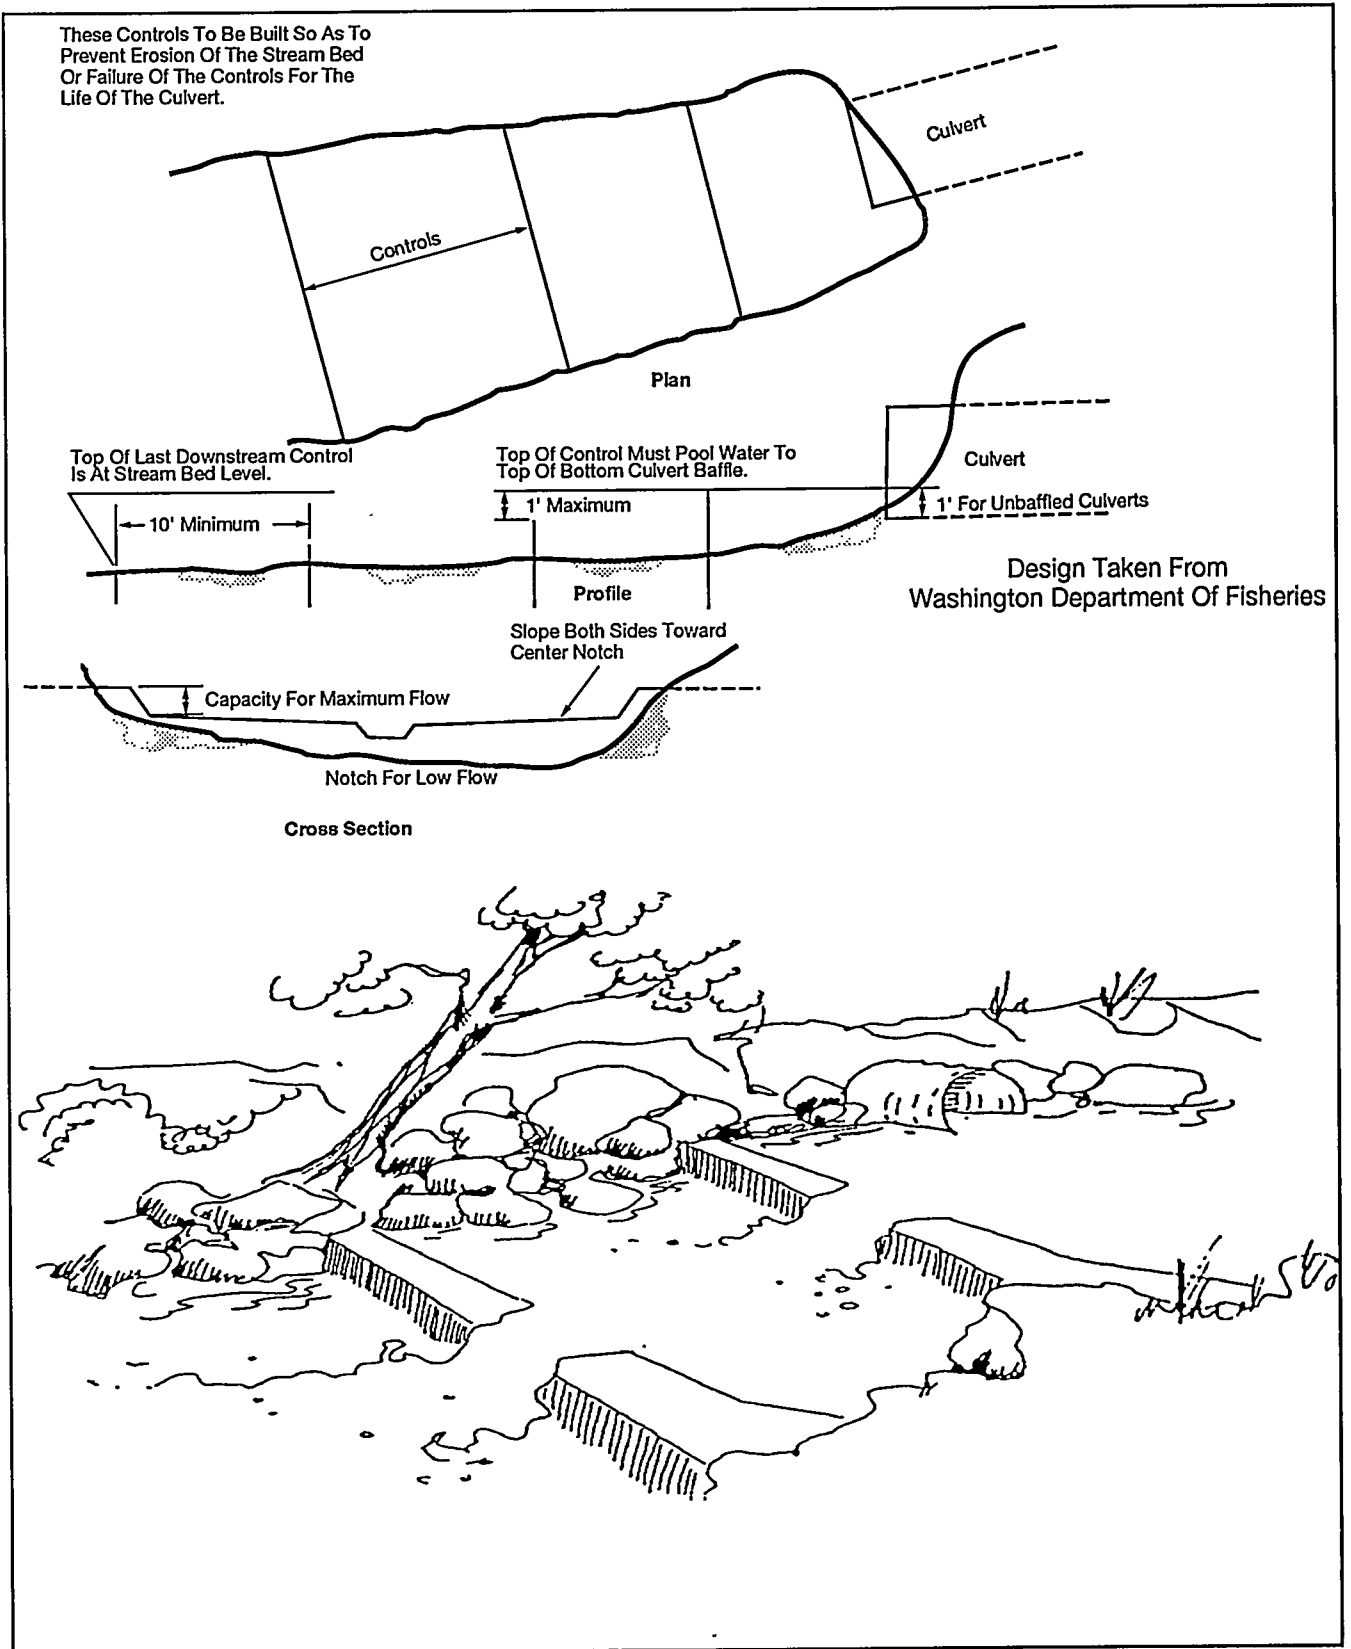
Gabion or concrete sills can raise tailwater elevations to facilitate fish entry into culverts. Evans and Johnston, 1980.
